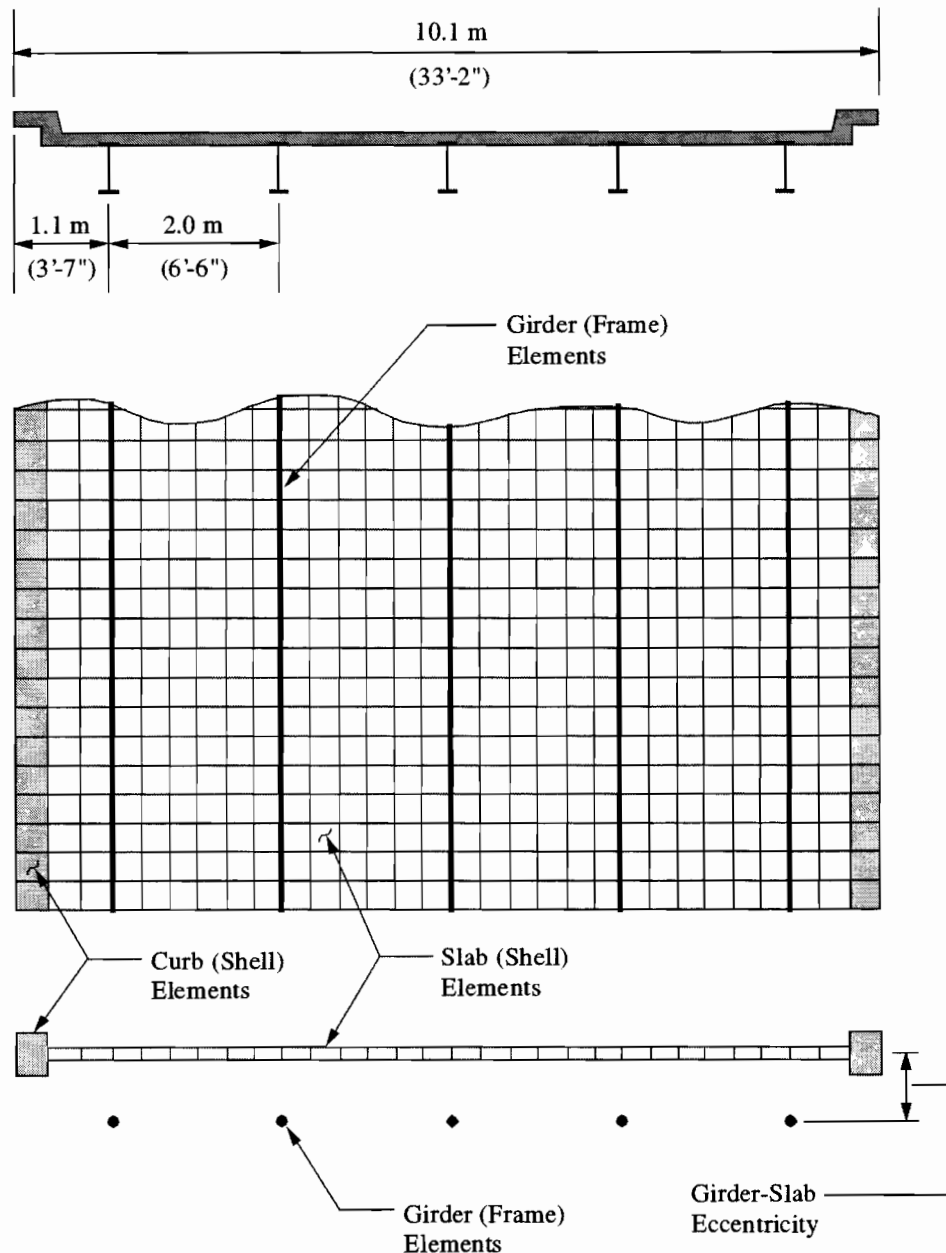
Finite Element Modeling of Marlin Bridge Units.
